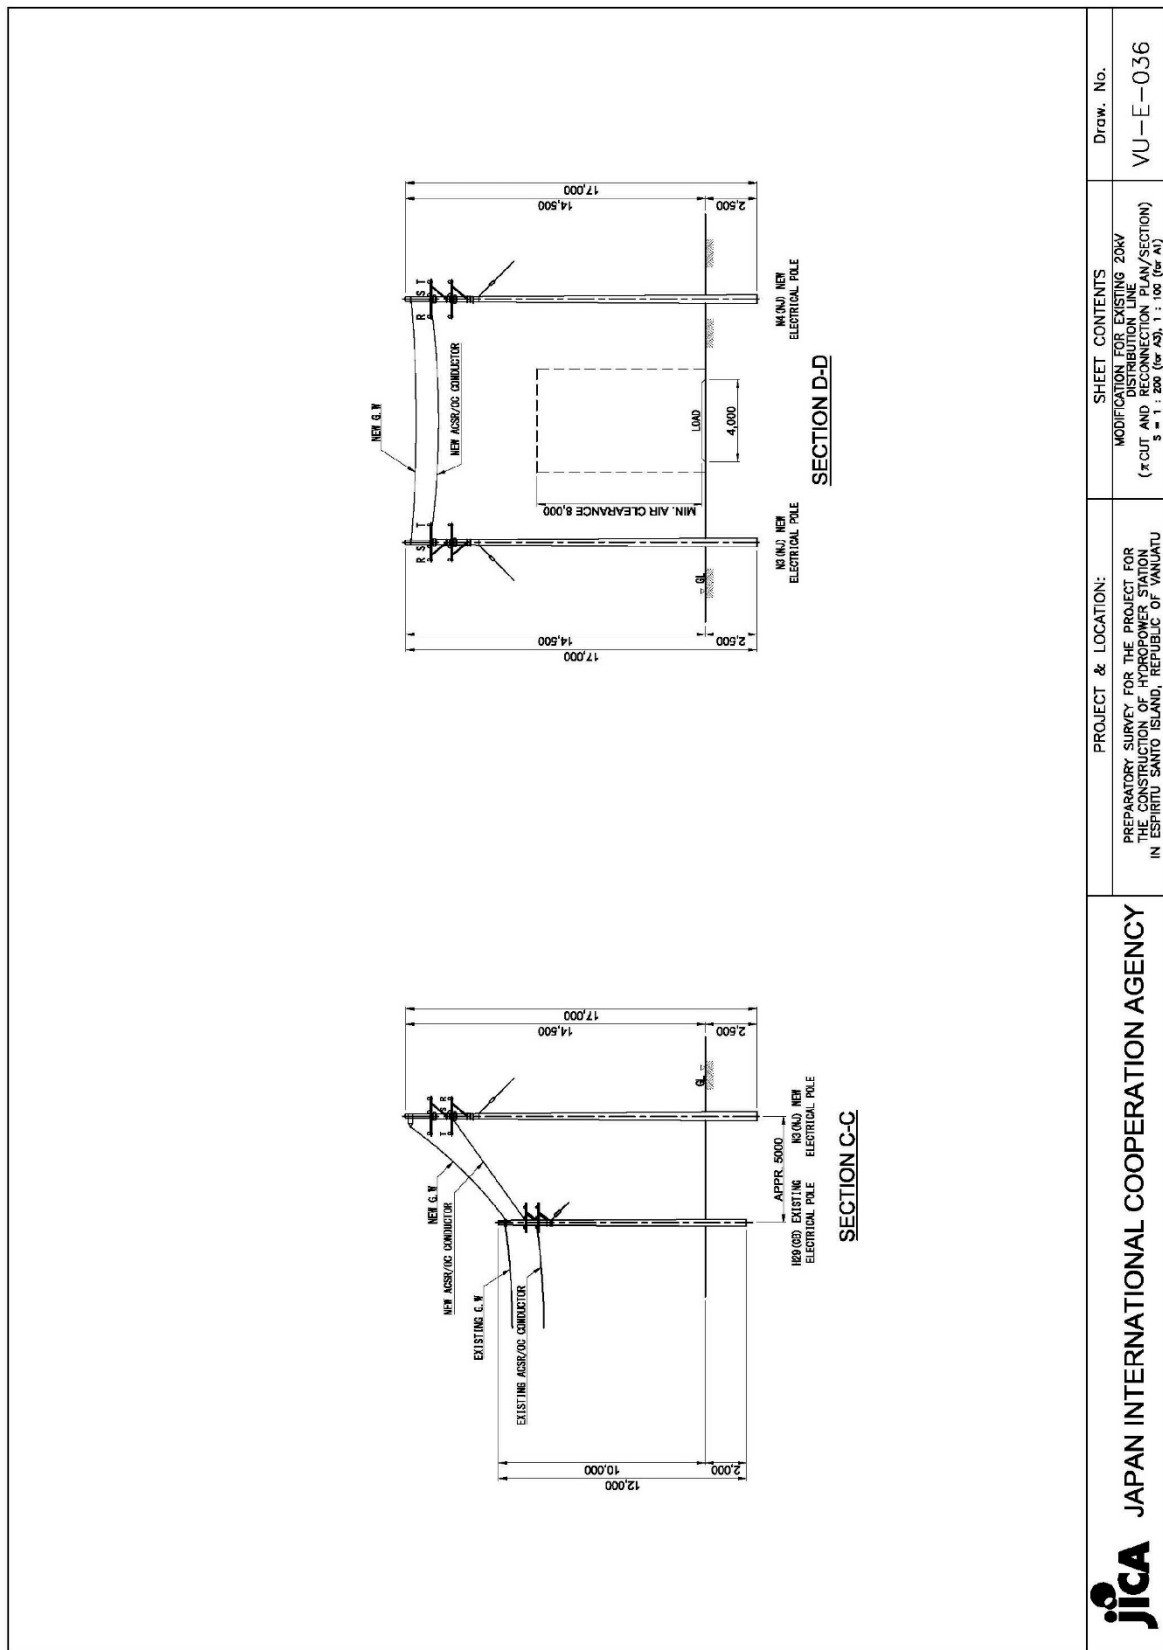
π (Pi) Branch Planning between existing and new Transmission Lines (2)
